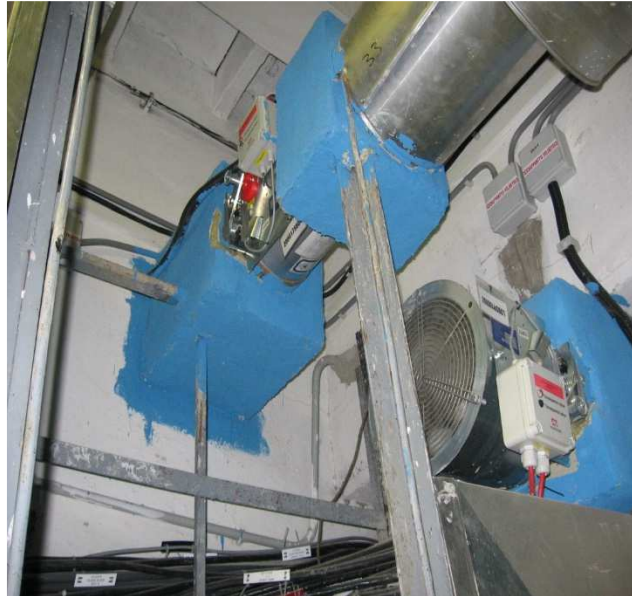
Installation of fire damper and passive fire protection of any ventilation pipes
